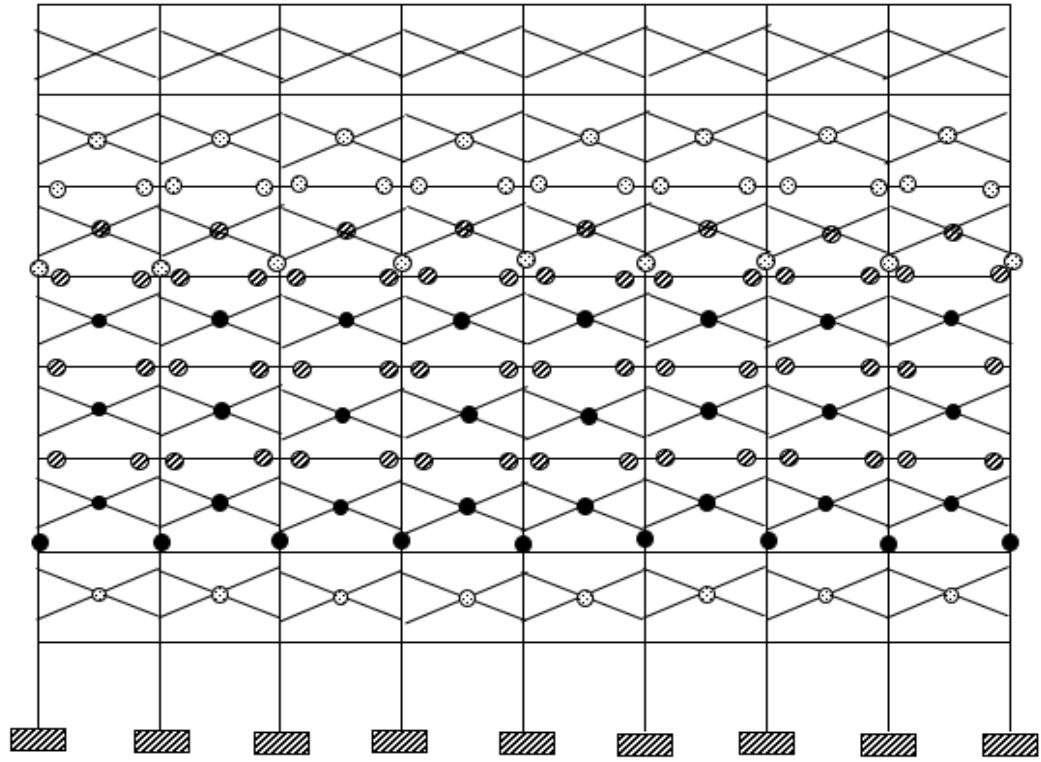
Typical failure mechanism at critical frame of mid-rise OGS_BIS building
